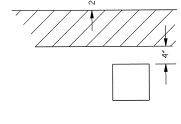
DETAIL A LATERAL PLACEMENT OF PAVEMENT MARKERS
